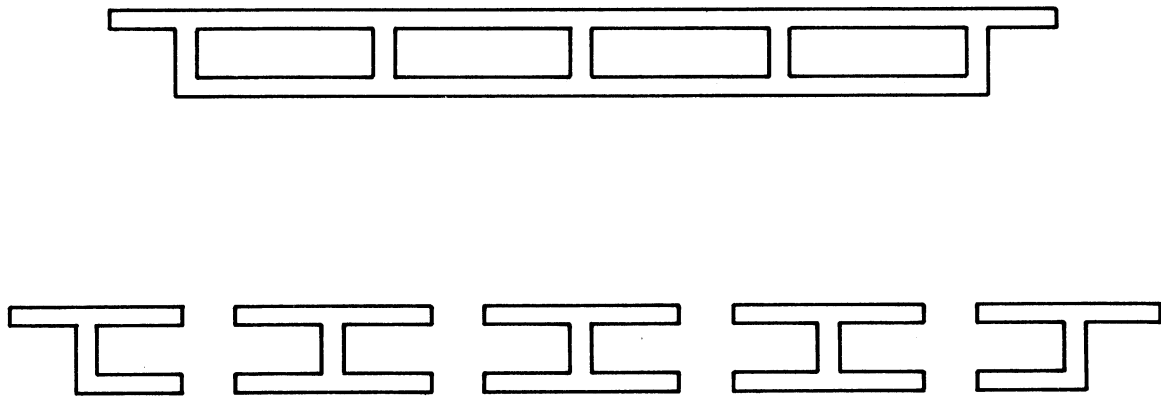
DESIGN MODEL FOR BOX GIRDER BRIDGE
